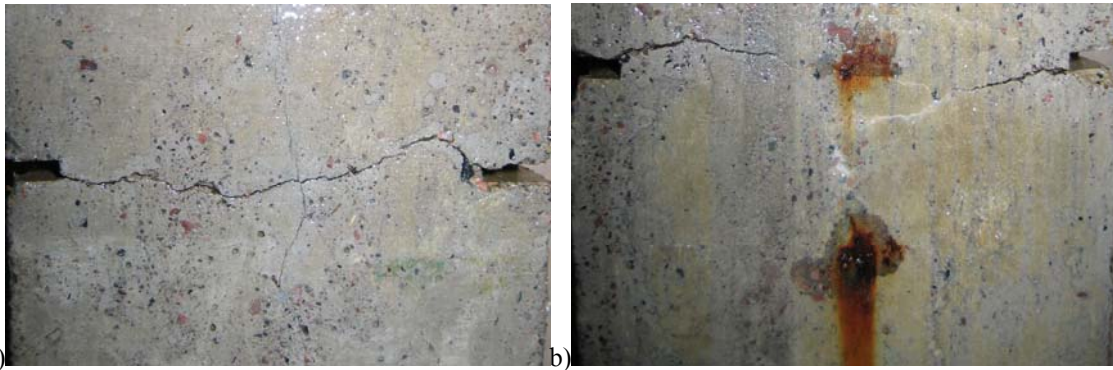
Surface cracks of the beam specimens corroded in sodium chloride solution after five years of exposure. a) Hot-dip galvanised reinforcement bar A500HW/Ø8/Zn (crack width $w = 0.39$ mm). b) Ordinary steel reinforcement bar B500K/Ø8, crack partly settled (crack width $w = 0.41$ mm).
